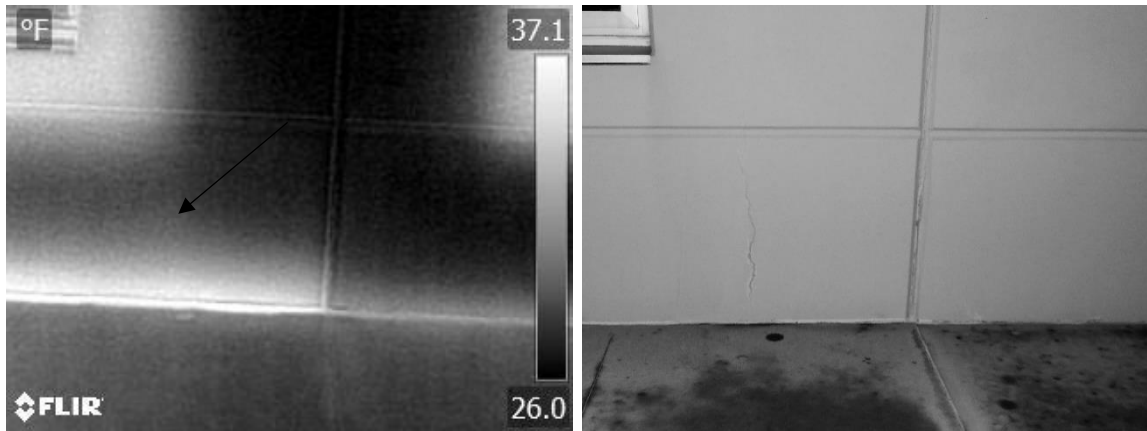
SWP structure with thermal bridging at foundation connection: thermal image (left) and visual image (right)
